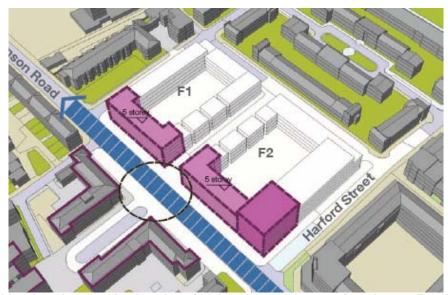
Massing plan showing location of higher rise elements on Ben Jonson Road
